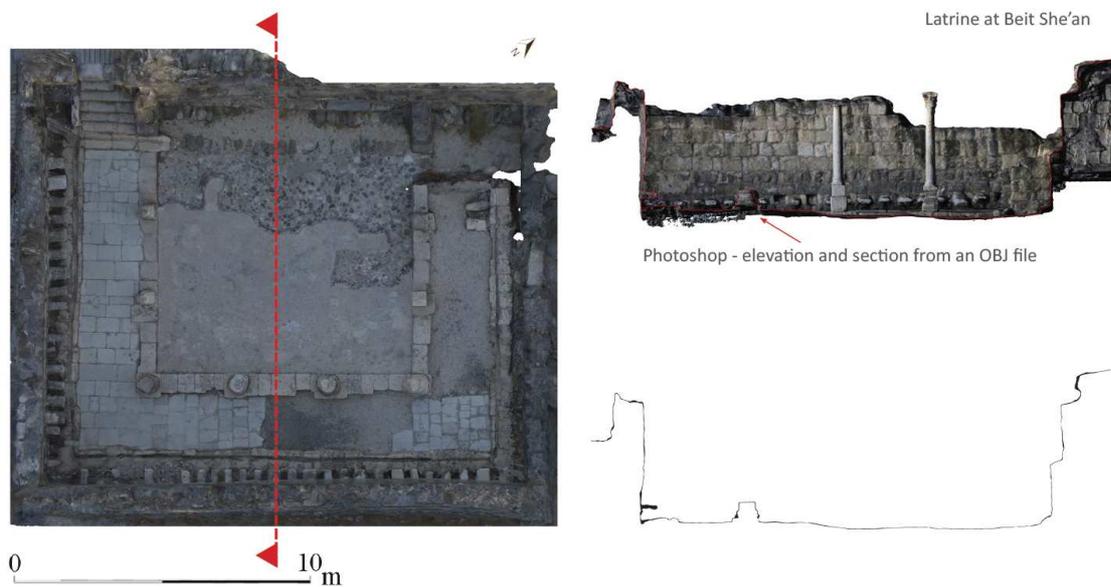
Plan view generated in Photoscan and section cut and elevation produced in Photoshop.
